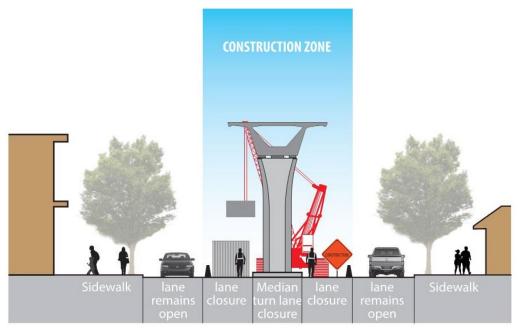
Construction of Elevated Guideway in Median (Typical Cross Section)
